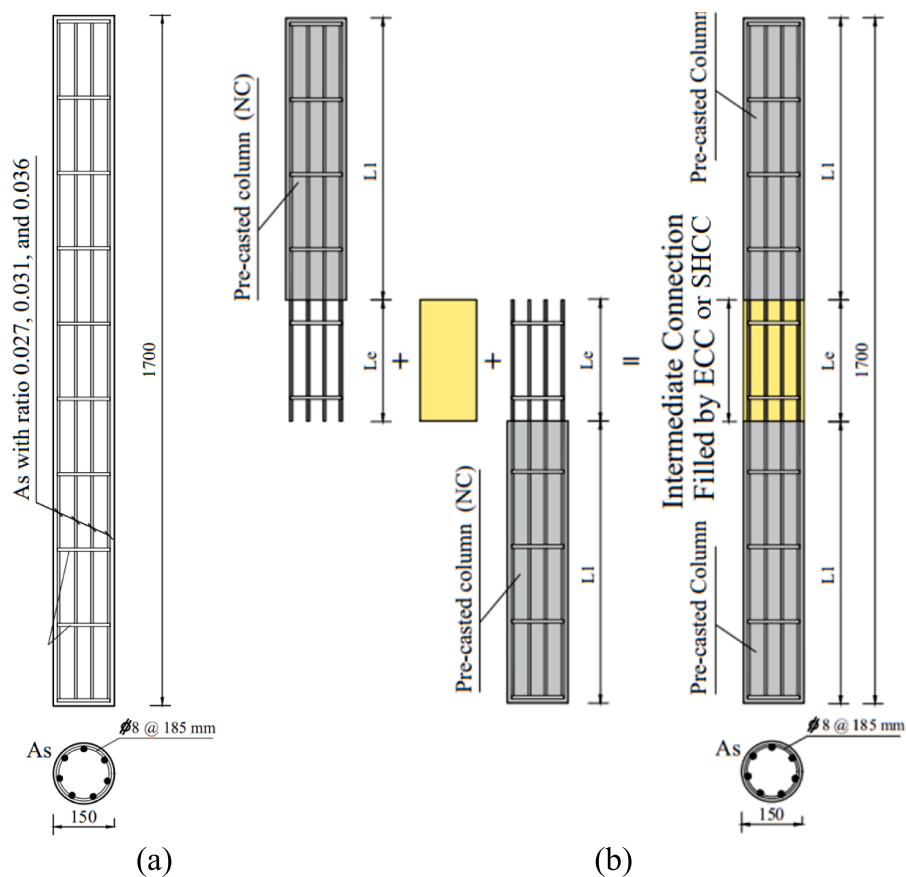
Geometric and reinforcement details of the columns: (a) control specimen,  $C_0$ , and (b) Precast RC columns with ECC/SHCC connection. (Units: mm).
